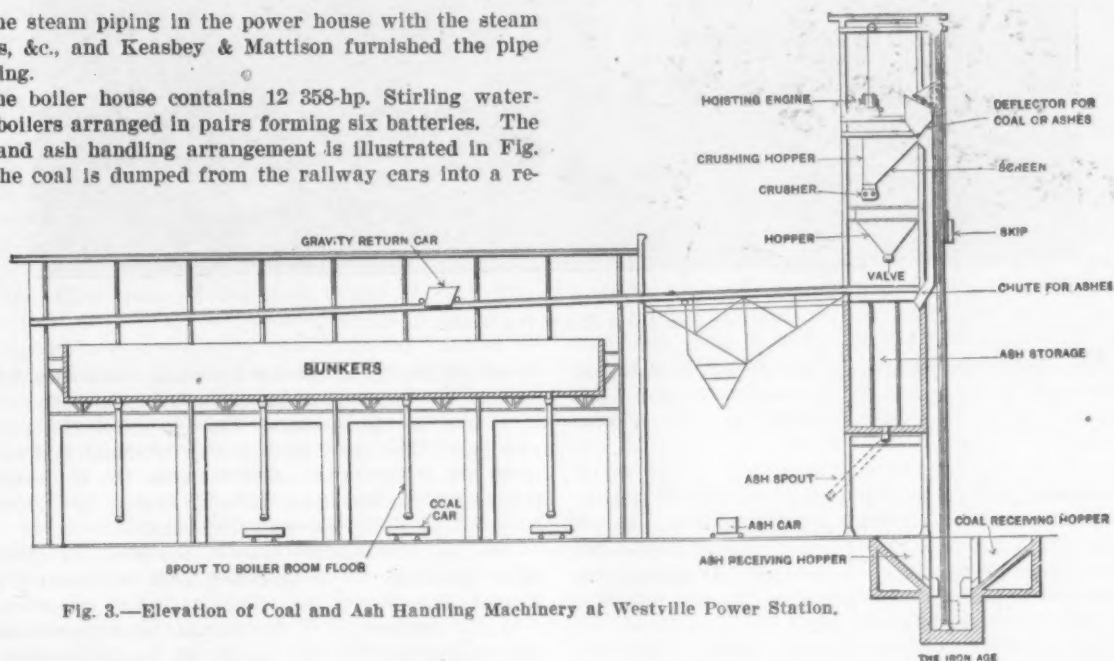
Elevation of Coal and Ash Handling Machinery at Westville Power Station.
